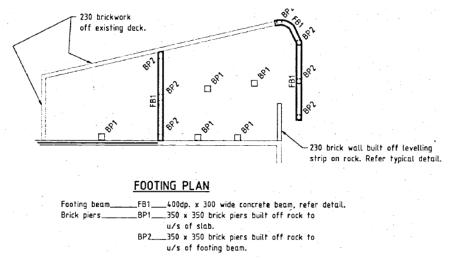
Approved footing plans (Reference H1246-S1 for Building Approval 808/94 (Source: GIPA request from NBC)
